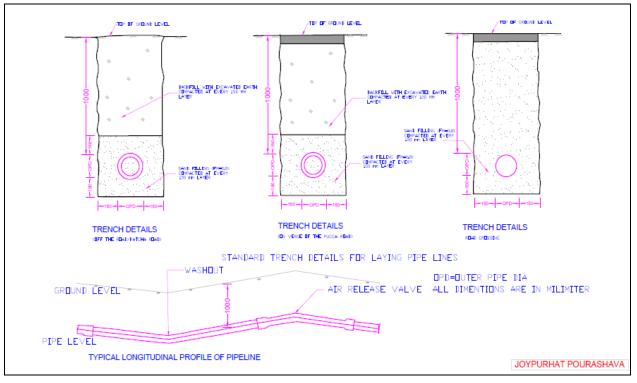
Typical Longitudinal Profile and Cross-Section of Pipeline
